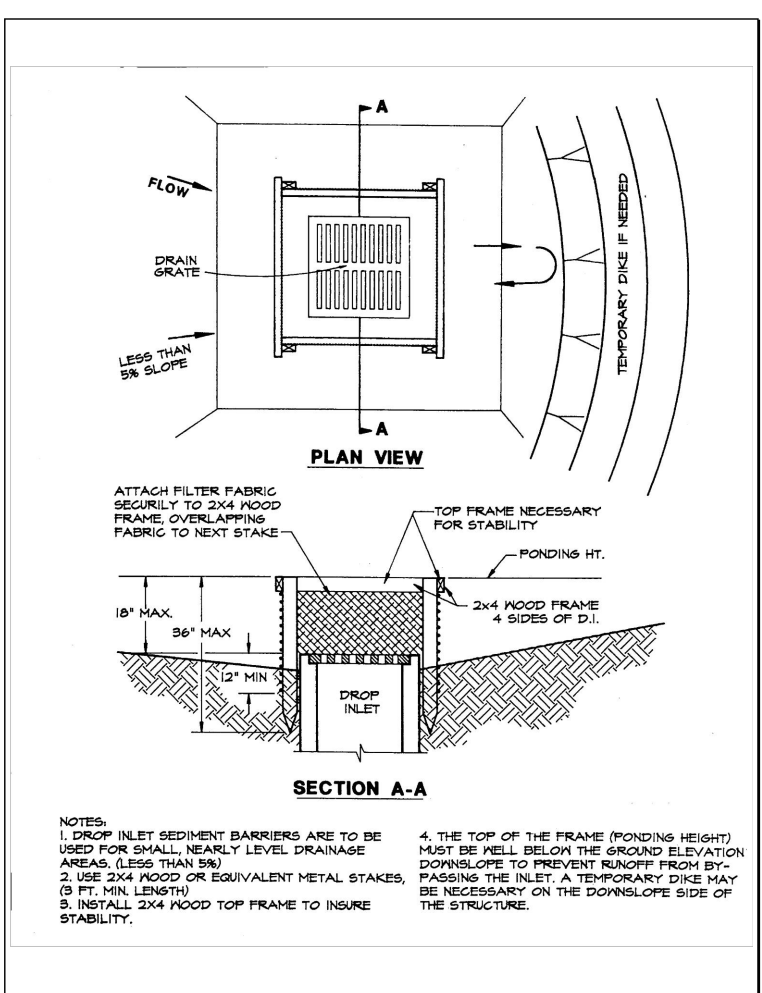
Silt Fence Drop Inlet Sediment Barrier
